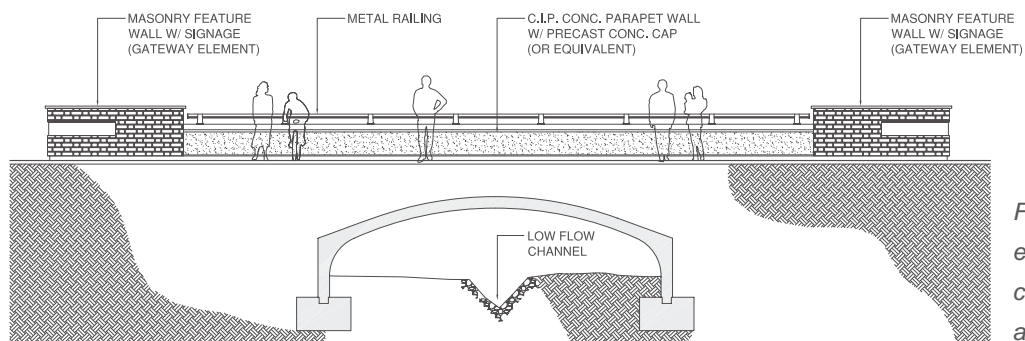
Conceptual elevation option of bridge crossing treatment option for arterial and collector roads.
